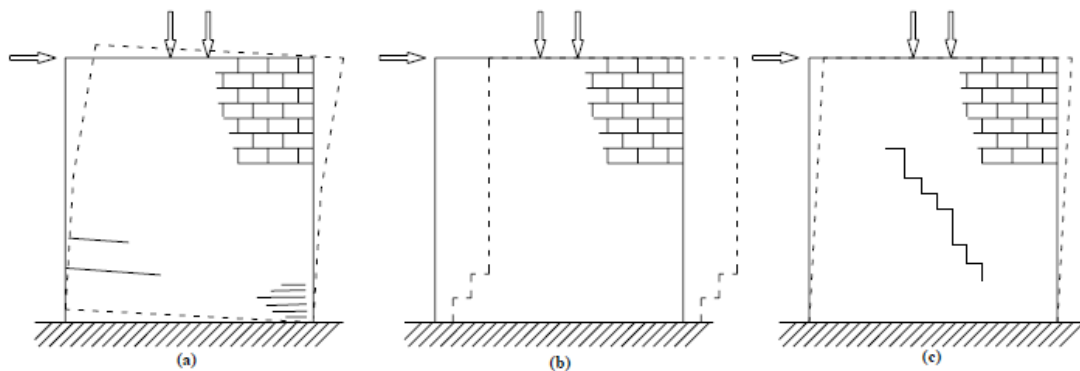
Failure modes for masonry walls subjected to in-plane lateral loads: (a) flexural, (b) sliding, and (c) shear (Voon, 2007)
